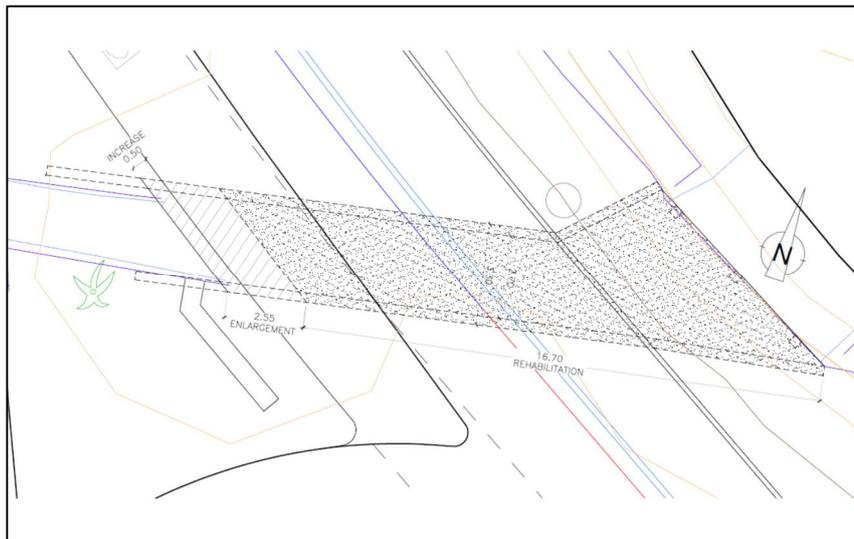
New structure proposed CH 7+300 (Pantufó Coastline)
